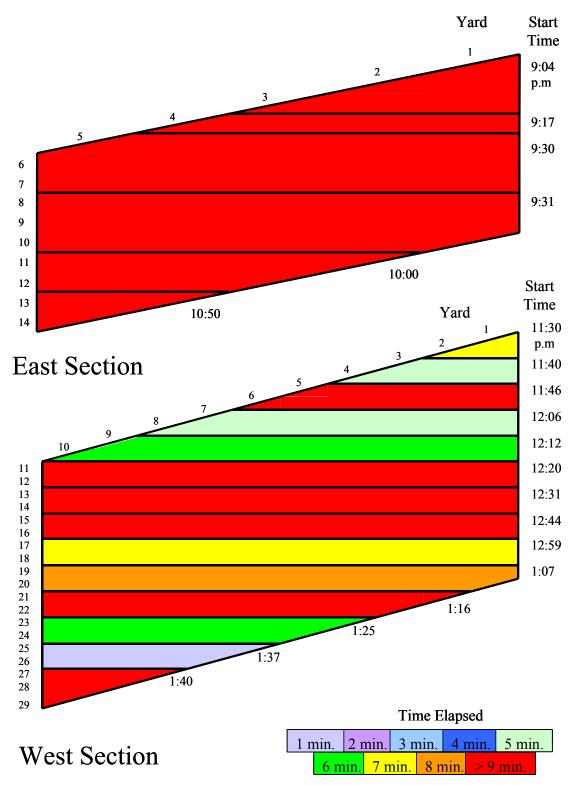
S26 of 50111, Concrete placement, time elapsed per yard
